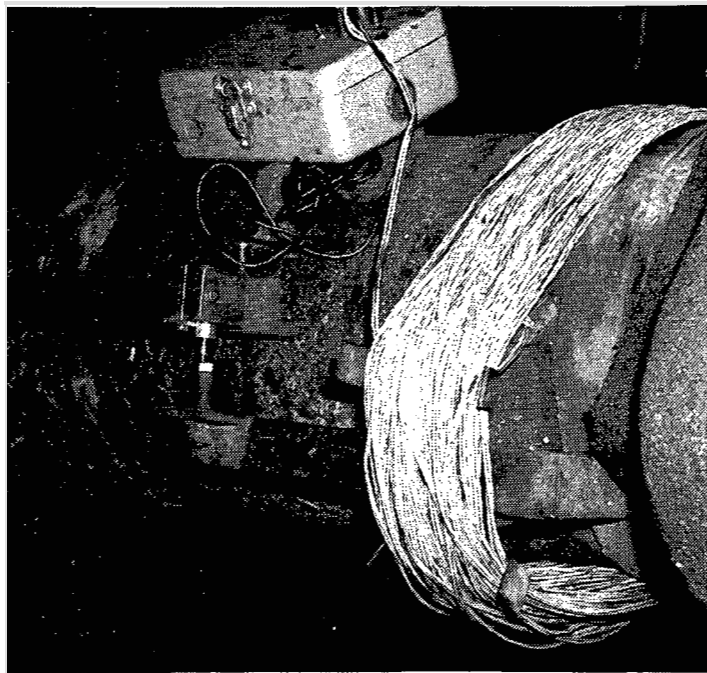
Measuring equipment on pressure feeder drive shaft.
